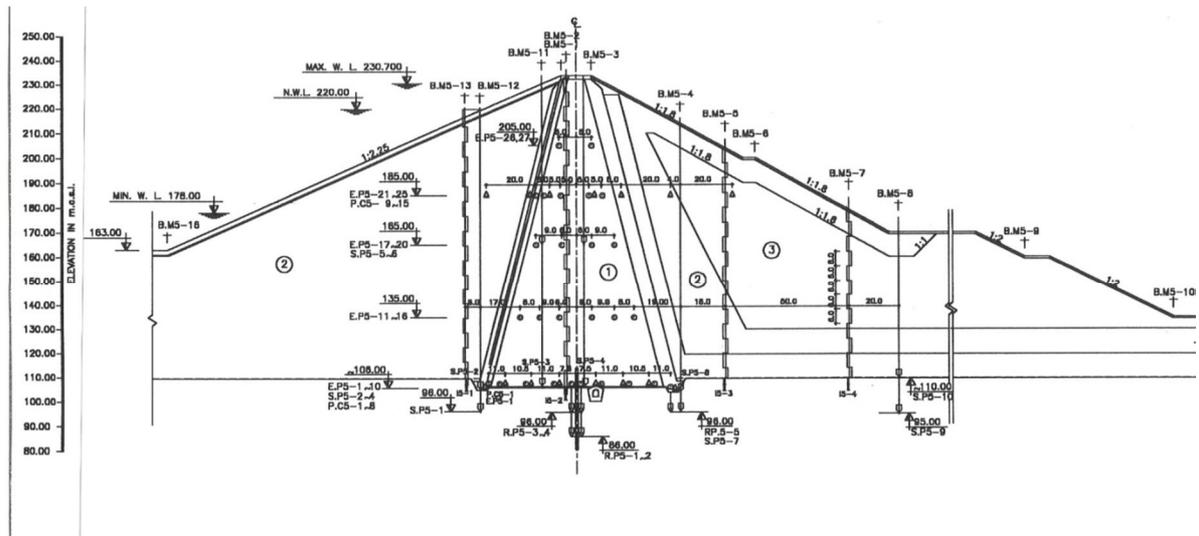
A. Maximum cross-section of the Karkheh Dam.
